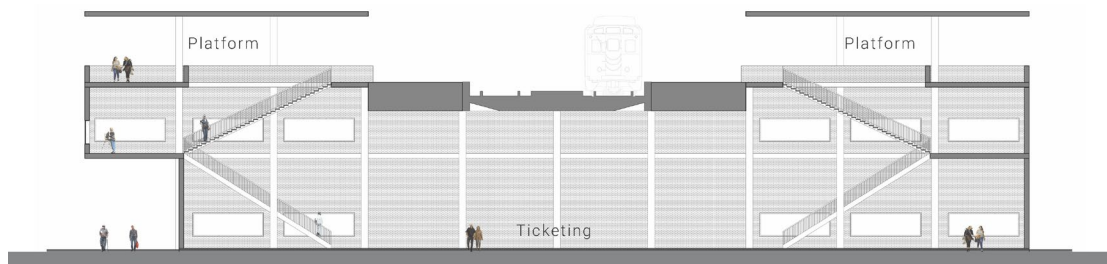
, Train Station - Section - EW – Building and Platform (Source: Drawn by Author)
